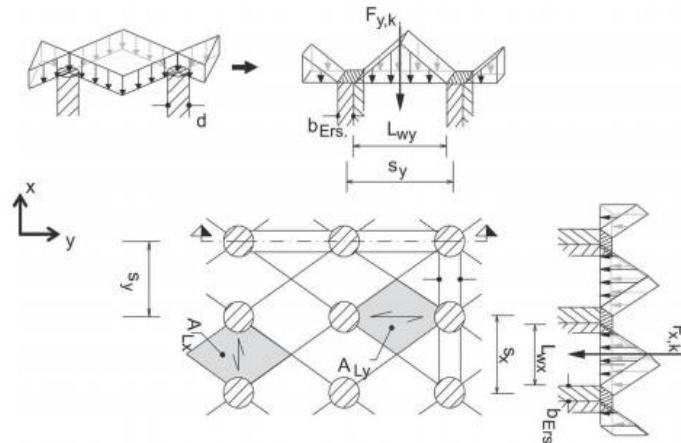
Plan view of foundation and geosynthetics (after Kempfert et al., 2004)
